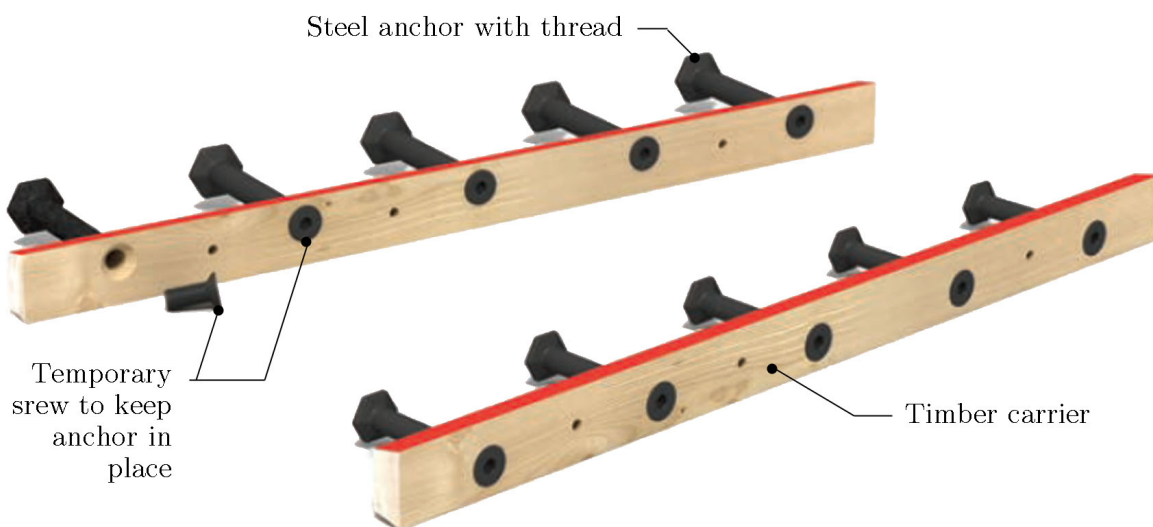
Timber Anchor Carriers (reworked from Ancon Building Products (2014))
